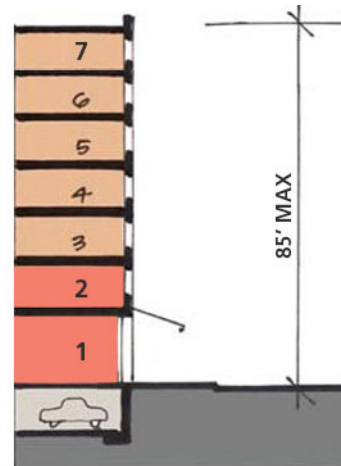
TYPE IIIA 85' max. wood frame construction
